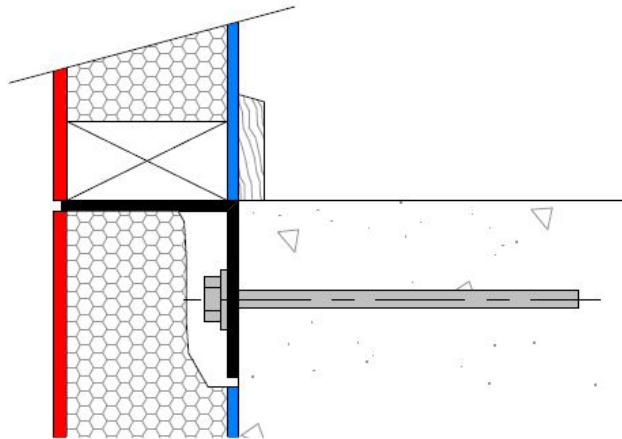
Framing Bottom Plate and Supporting Steel Angle
